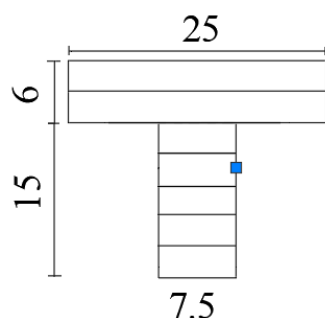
Cross-section Diagram of 1-3 Specimens (cm)
